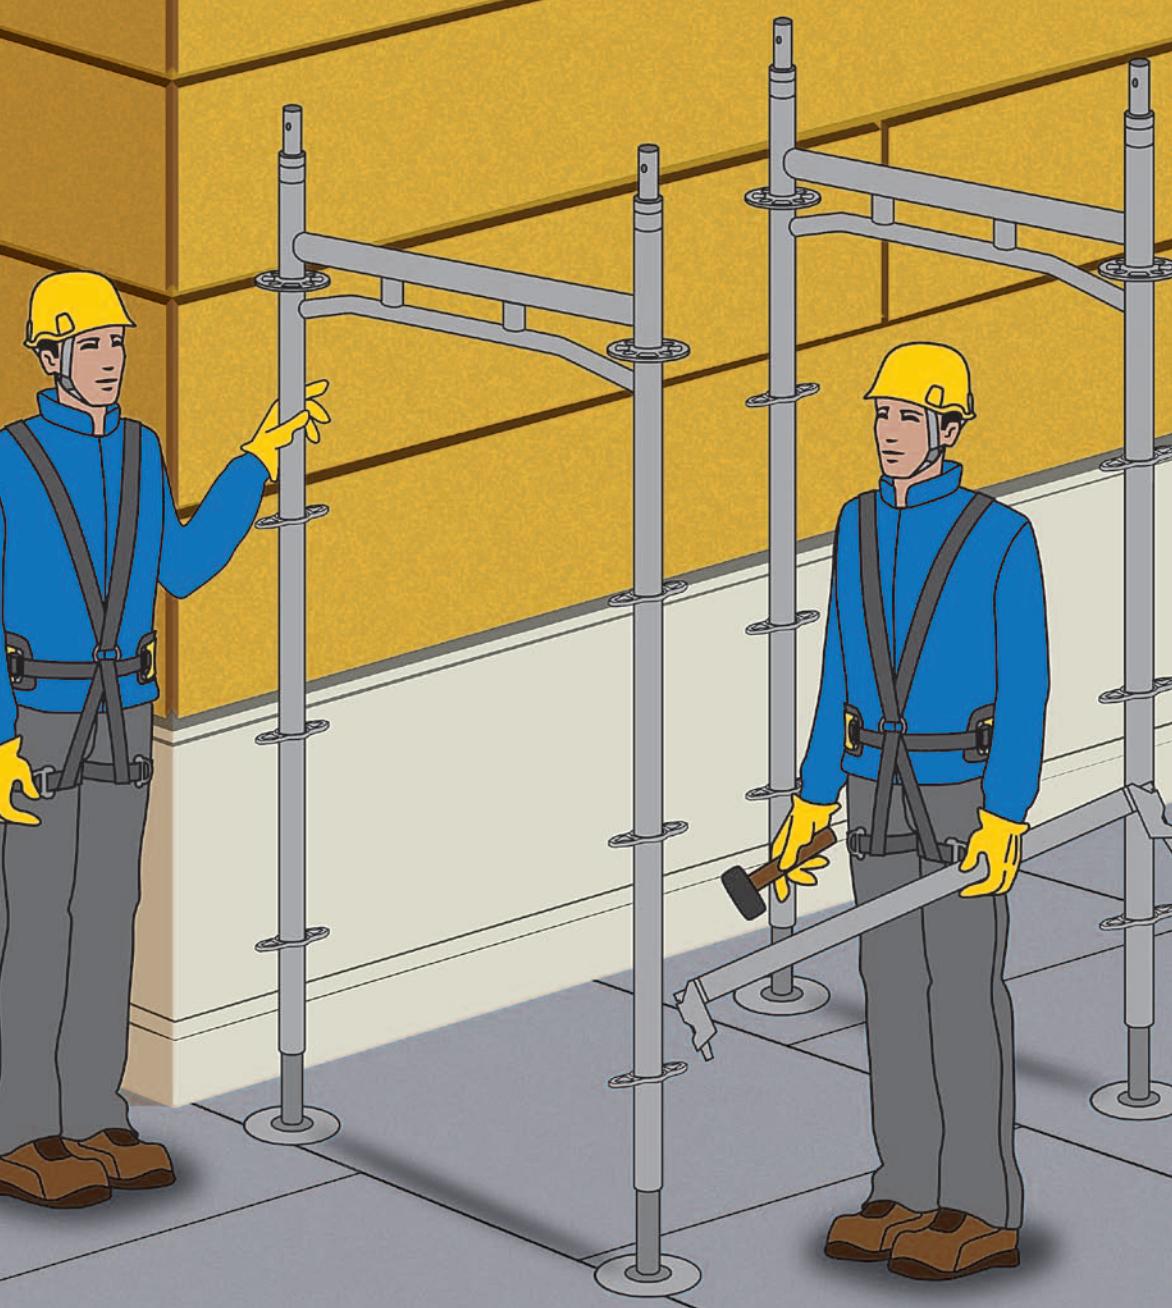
Scaffolding made of prefabricated frames. Connection system (clamp with wedge and washer)
